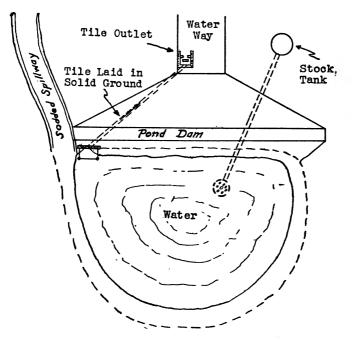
View of pond layout showing location of tile line and outlet in relation to the dam and waterway.
